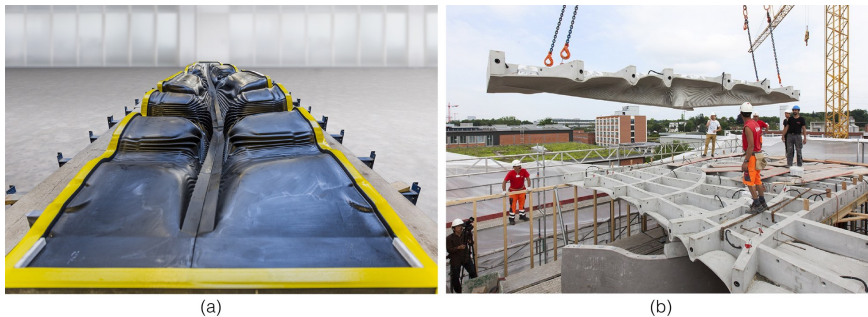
“Smart Slab” of the DFAB house at Nest EMPA Dübendorf, Switzerland built using 3D printed sand moulds: (a) binder jet sand printed mould for a section of the slab; (b) assembly of precast slab sections on-site (photo credit: (a) Andrei Jipa; (b) Tom Mundy).
